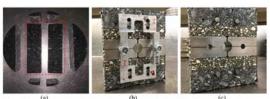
Assembly of CSIC composite specimen: (a) Cutting to obtain two symmetrical parts (plan view), (b) Two symmetrical parts aligned and glued to the central metal spacer, and (c) Complete CSIC specimen installed with gauge points.
